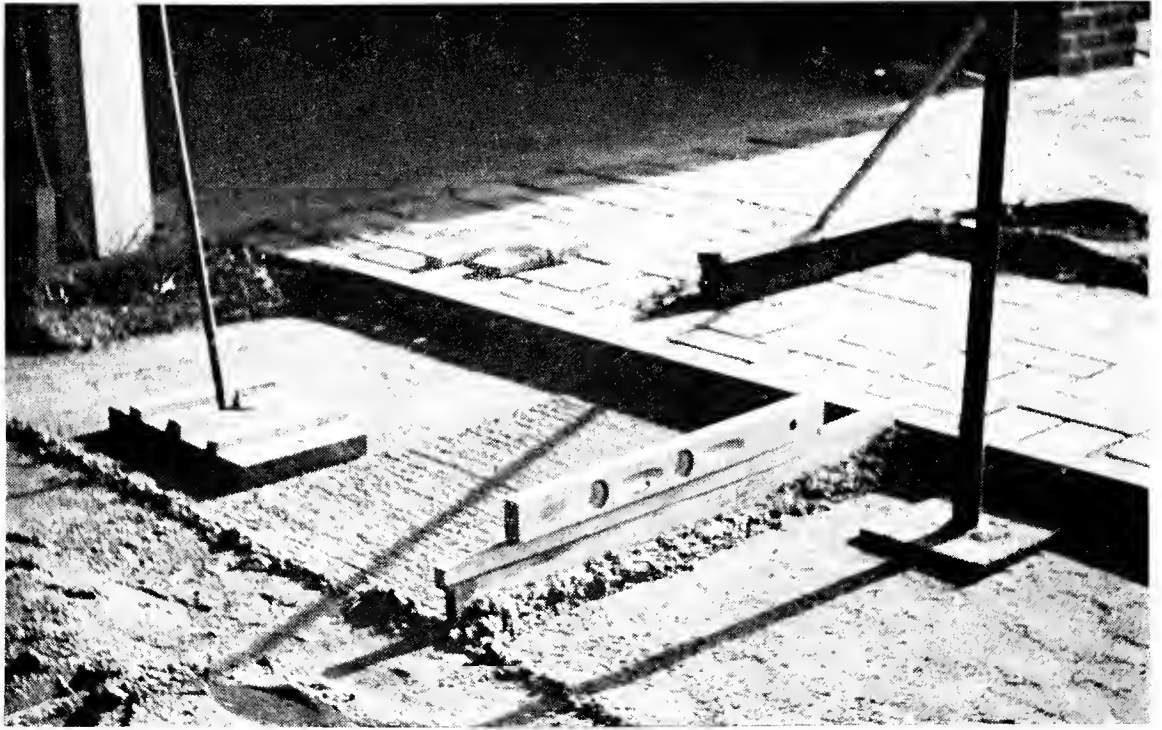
Construction detail, showing redwood header, screed and level, and tamps used to compact sand.
